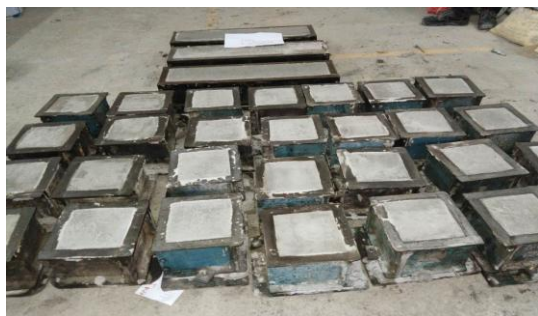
Hardened Concrete in Cube & Prism Specimens
